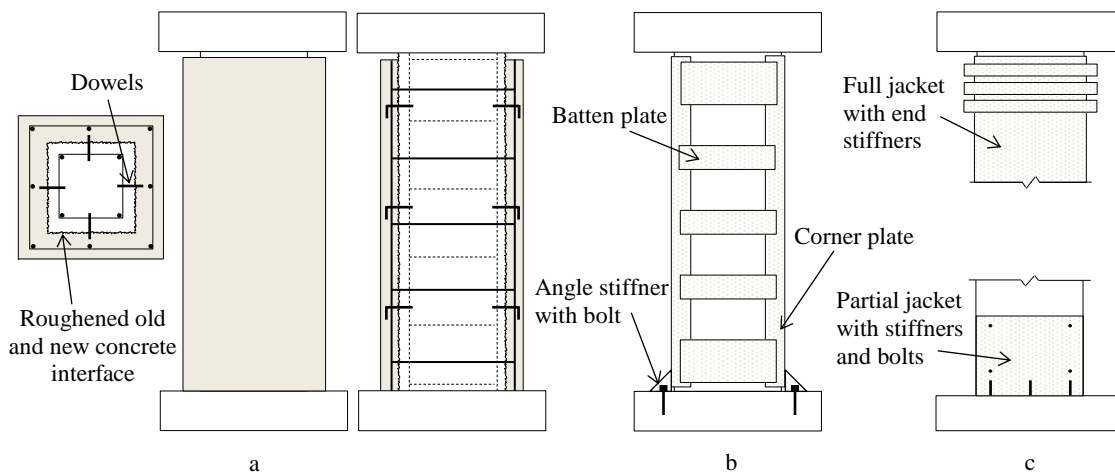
Strengthening scheme examples: a) concrete jacketing, b) steel cage, c) steel jacketing
